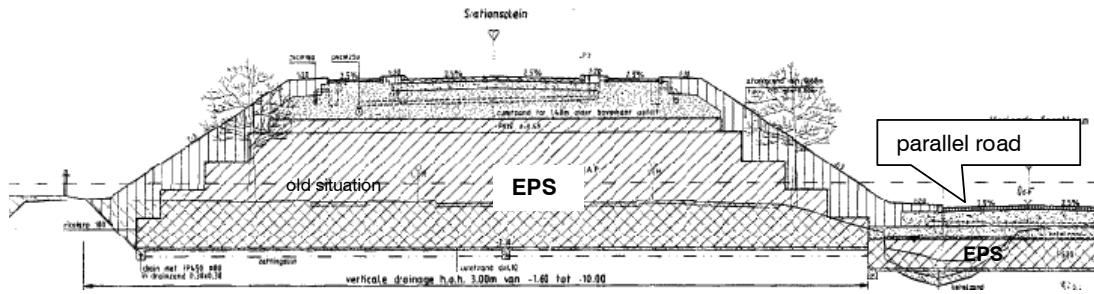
Cross section of the western access and parallel road near the crossover number 29
